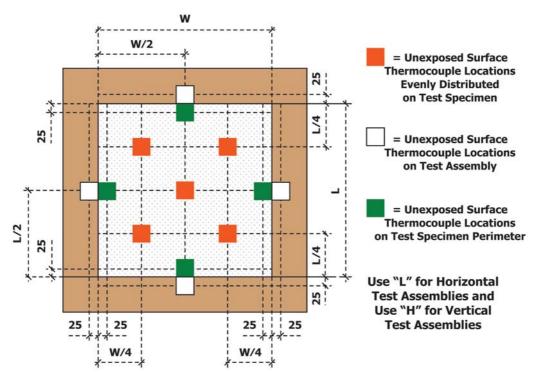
Thermocouple Locations for Horizontal and Vertical Test Specimens
